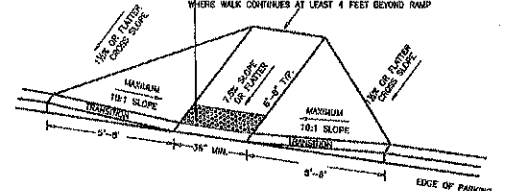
DETAIL OF DIMENSIONS FOR ACCESSIBLE SPACES
